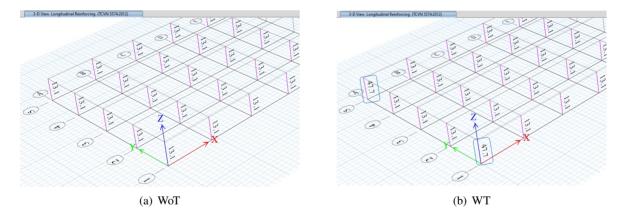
Design reinforcement (cm²) for columns showing the critical column positions in model S3
